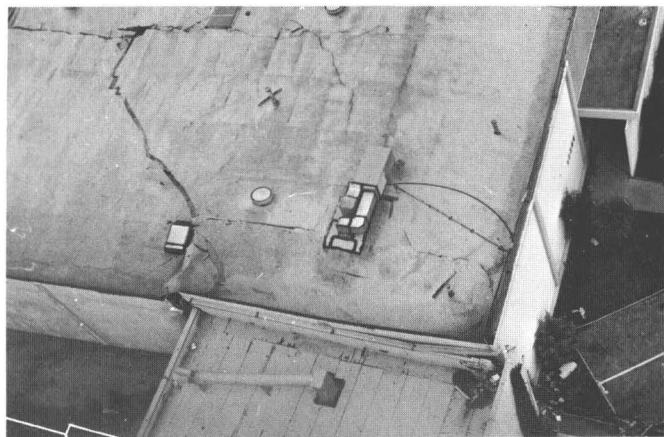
Detail of interpenetration of two buildings caused by ground rupture. Edges of asphalt paving, outlined in lower left corner of photograph, overlap by 0.49 m. Near southeast end of Gladstone Avenue, near San Fernando Ranger Station.
